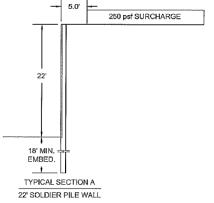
Soldier Pile System (Acceptable Load on wall)
